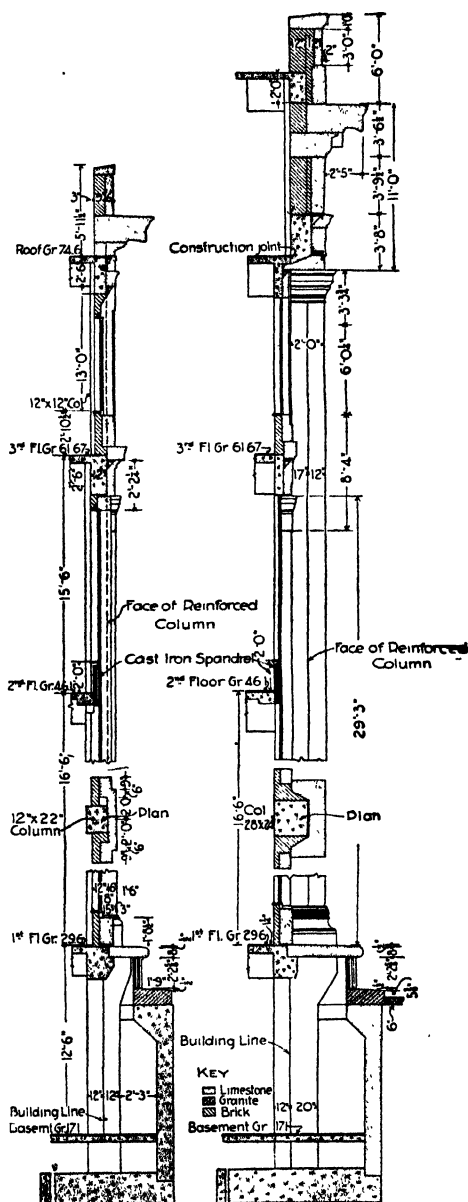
Ornamental Façades on Major and Minor Courts. Massachusetts Institute of Technology, Cambridge. (See p. 617.)
